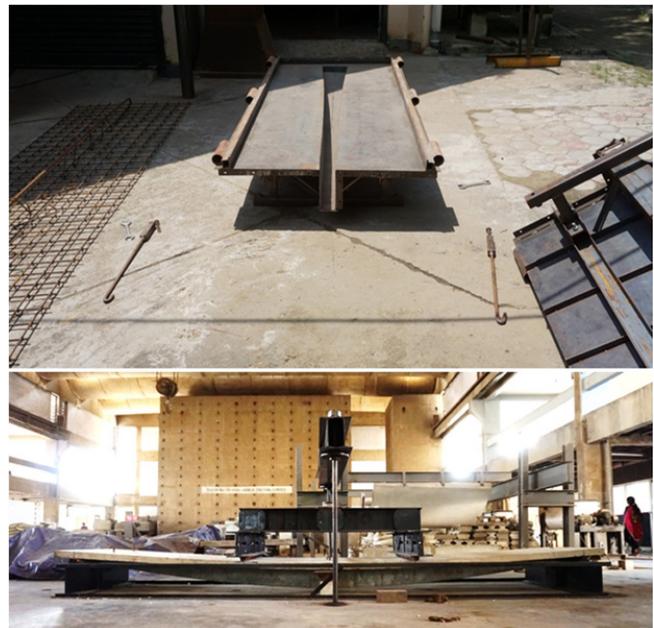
a) Disassembled curved sheet metal formwork for full-scale prototype with rebar shown to the right b) Load test configuration at NCCB in Faridabad, India, after the prototype was tested.
